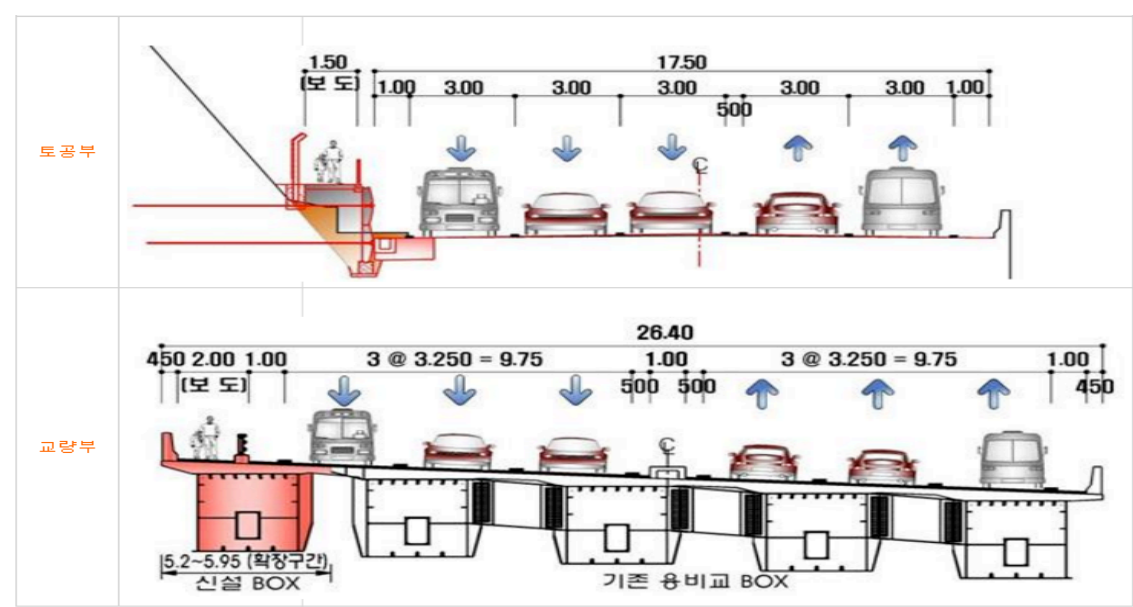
Cross-section Diagram: Yongbi Bridge-Seongsu Bridge
